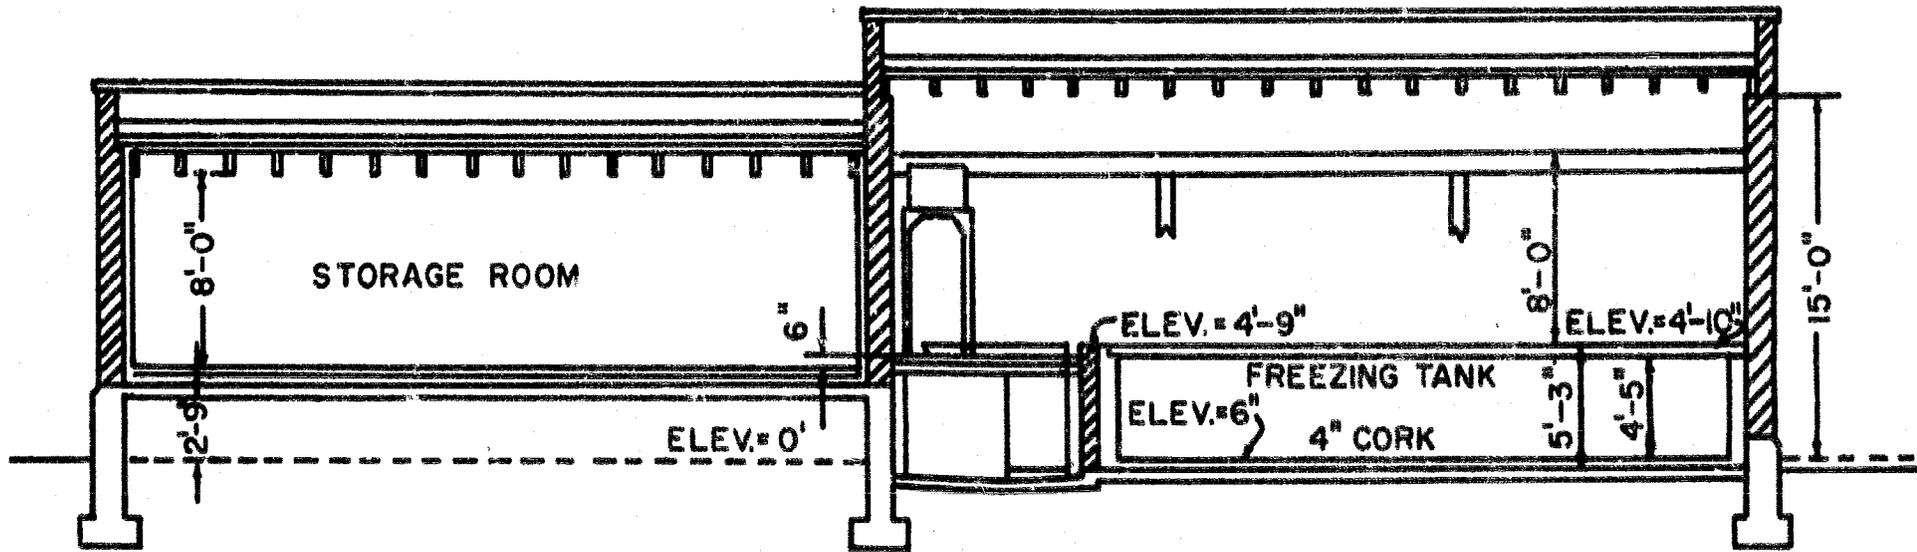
Elevation View of a Typical 10-Ton Ice Plant
